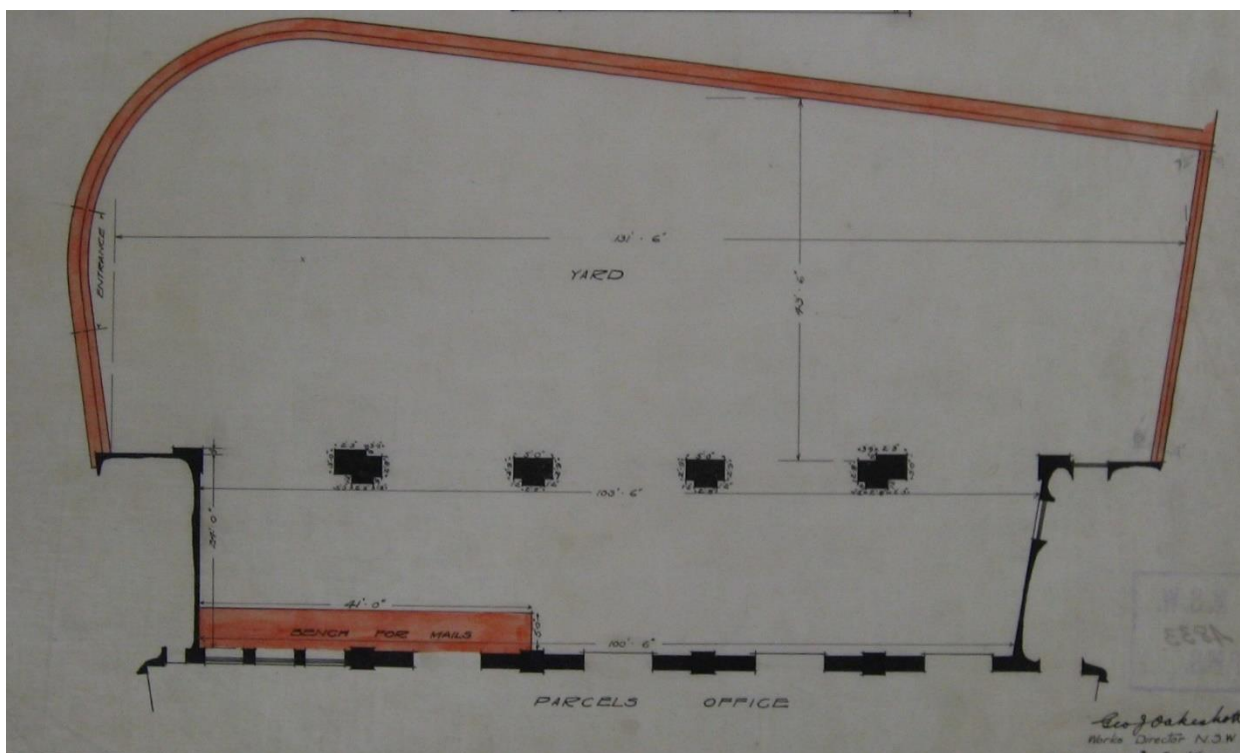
Mail Sorting Office Central Railway Station Sydney, block plan of yard, 3.2.1914. Signed by George J Oakeshott (Works Director)
